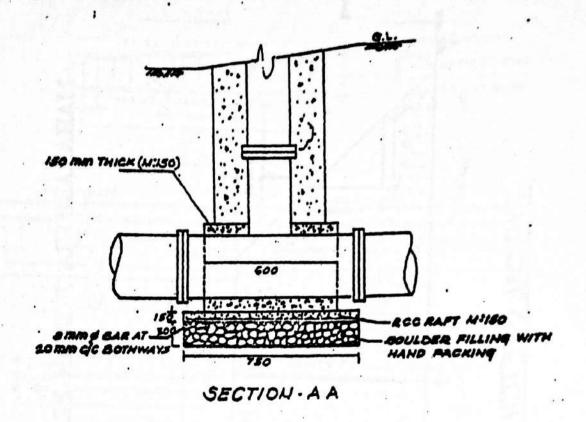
DETAILS OF CAGE FOR SINGLE BALL AIR VALVES 50mm & BELOW 50mm &
